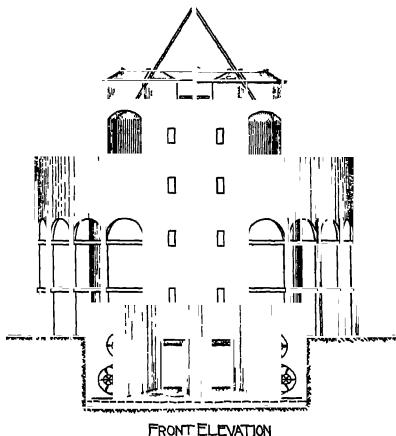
Elevation of the outlet works of proposed Dublin detention dam.
